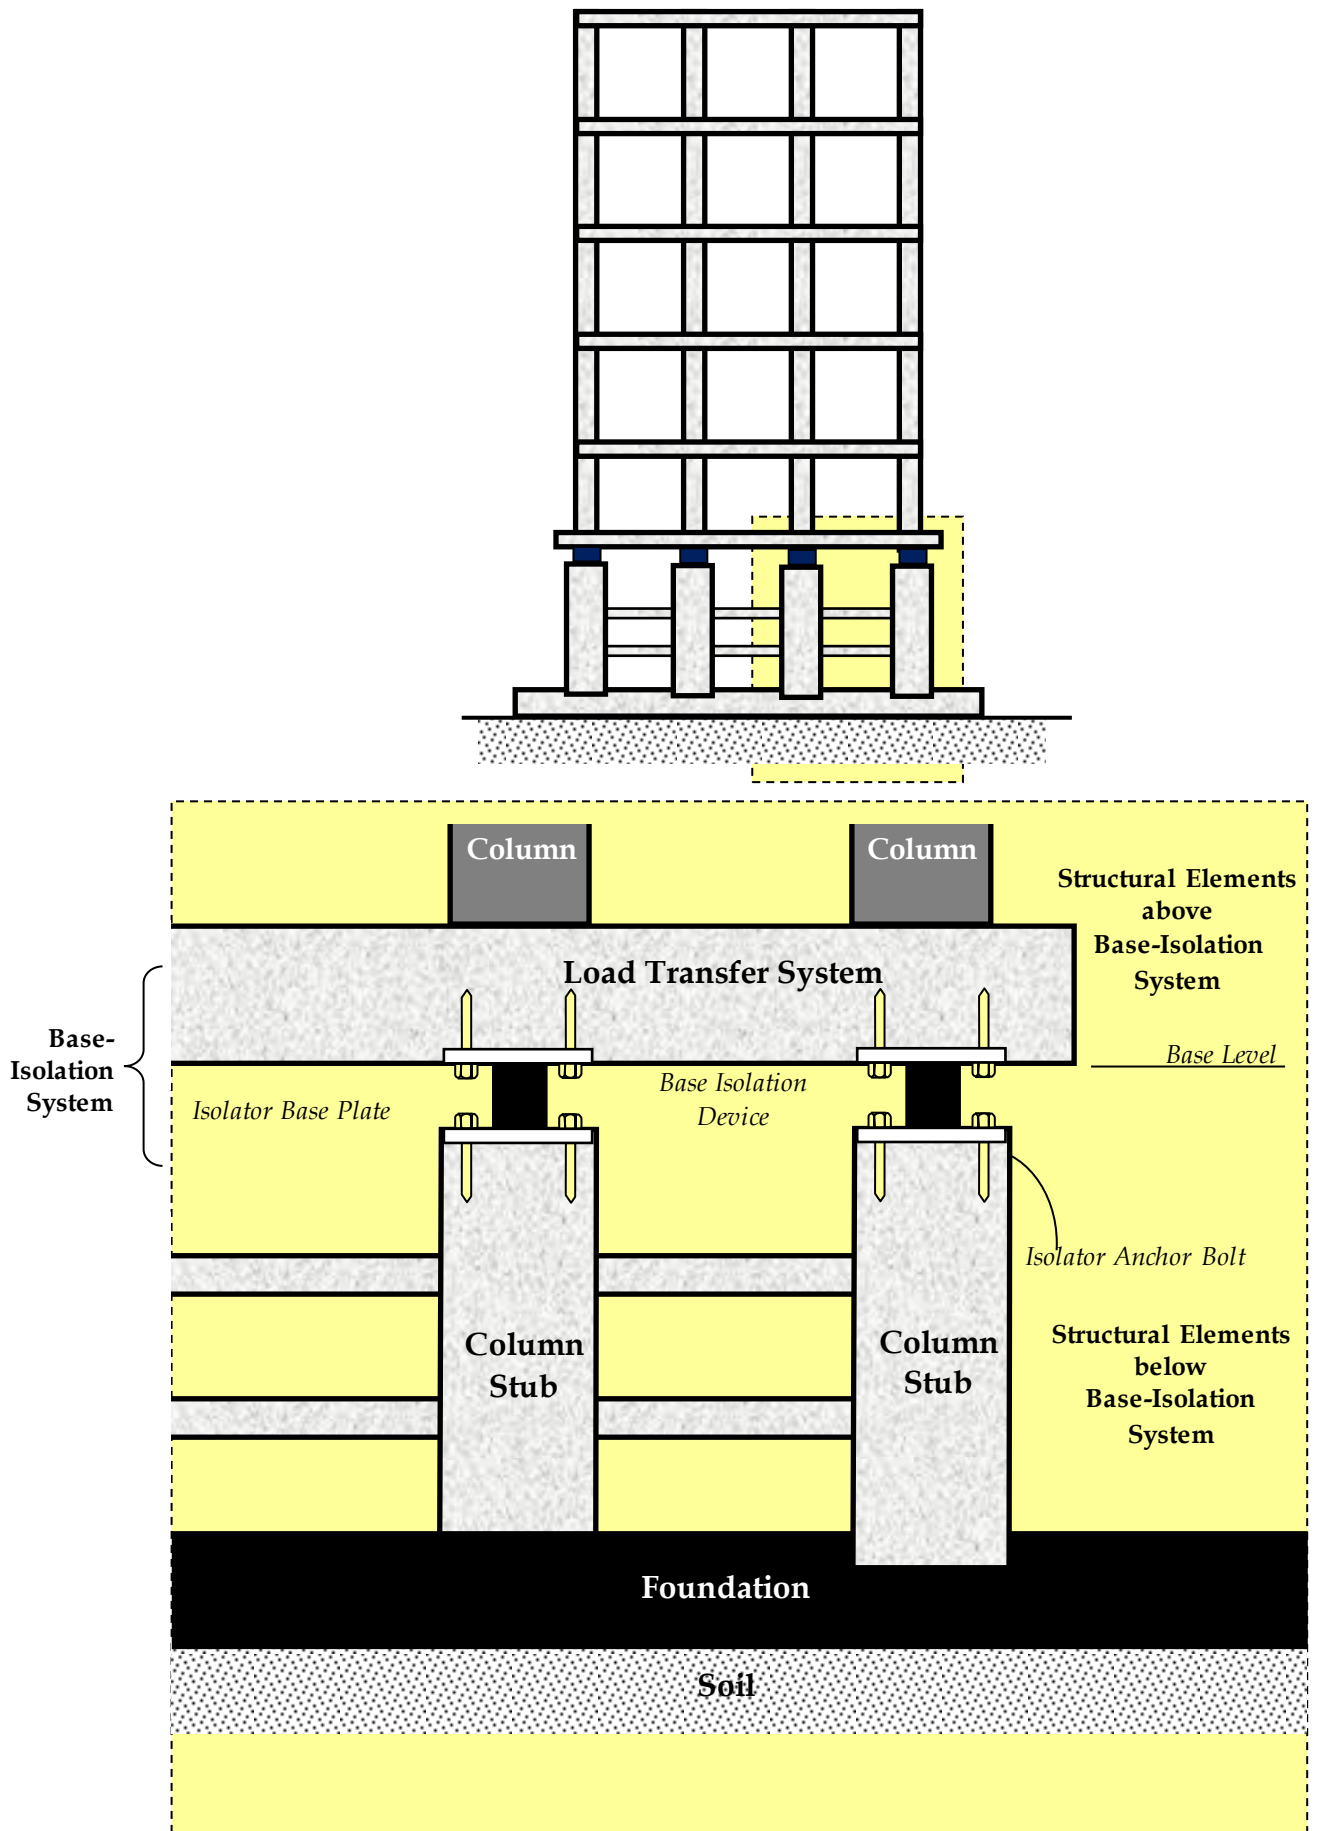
SECTIONAL ELEVATION OF A BASE ISOLATOR BUILDING
